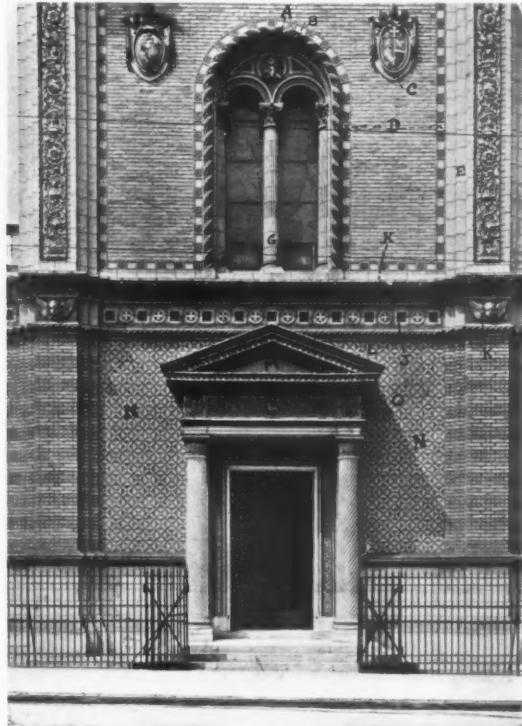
DETAIL OF HEARST BUILDING, CHICAGO, ILL.
